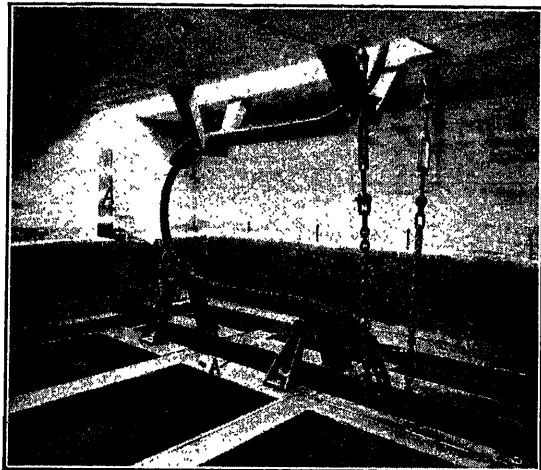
SPARE CABLE SUPPORT AND SLOTS
